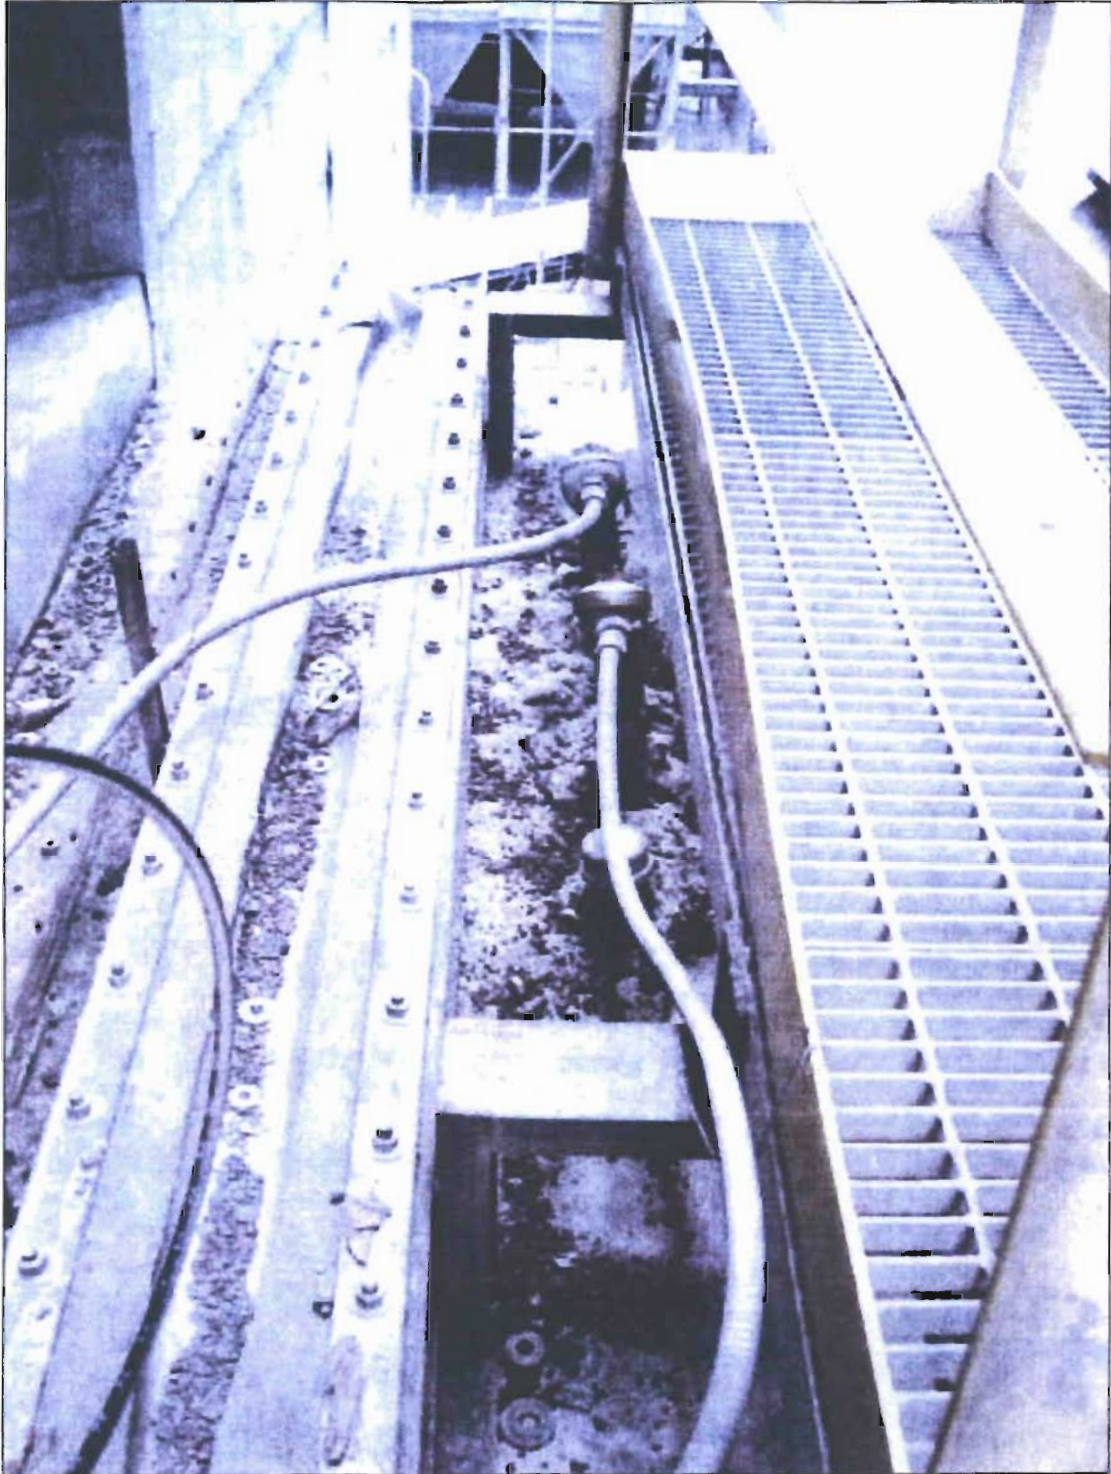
#2 Kiln—Raw Mill BH Inlet Thermocouples.
